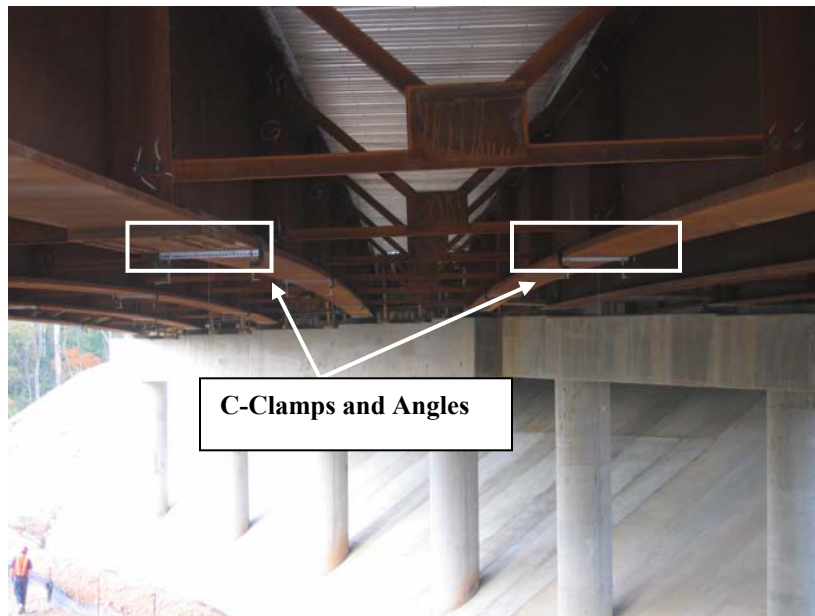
C-Clamps and Angles attached to Bottom Flanges of Wilmington Street Bridge
